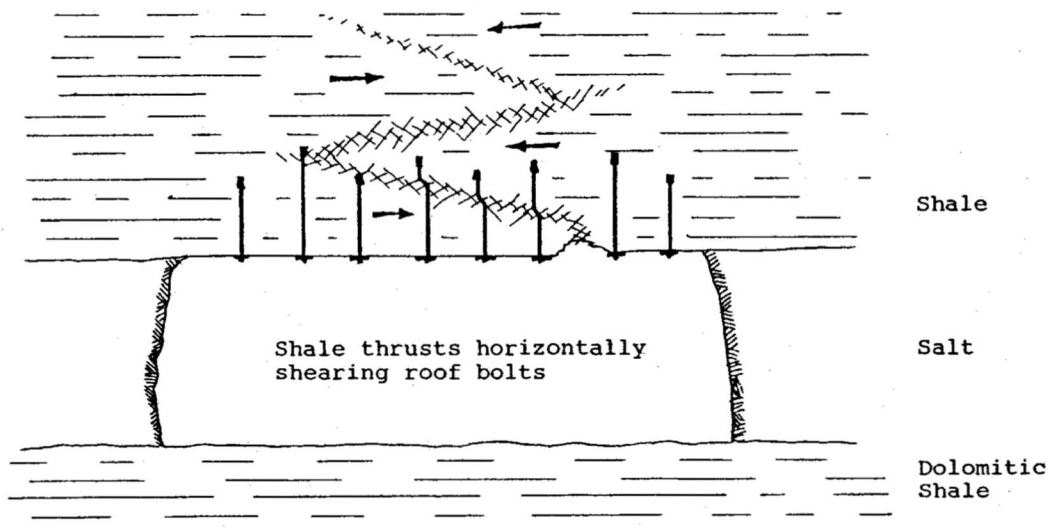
Cross section of typical roof failure in shale roof.
